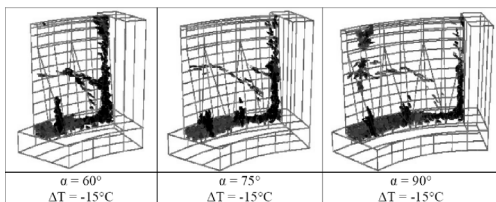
Crack pattern occurring in the dam under gravity loads, shrinkage and hydrostatic pressure.
